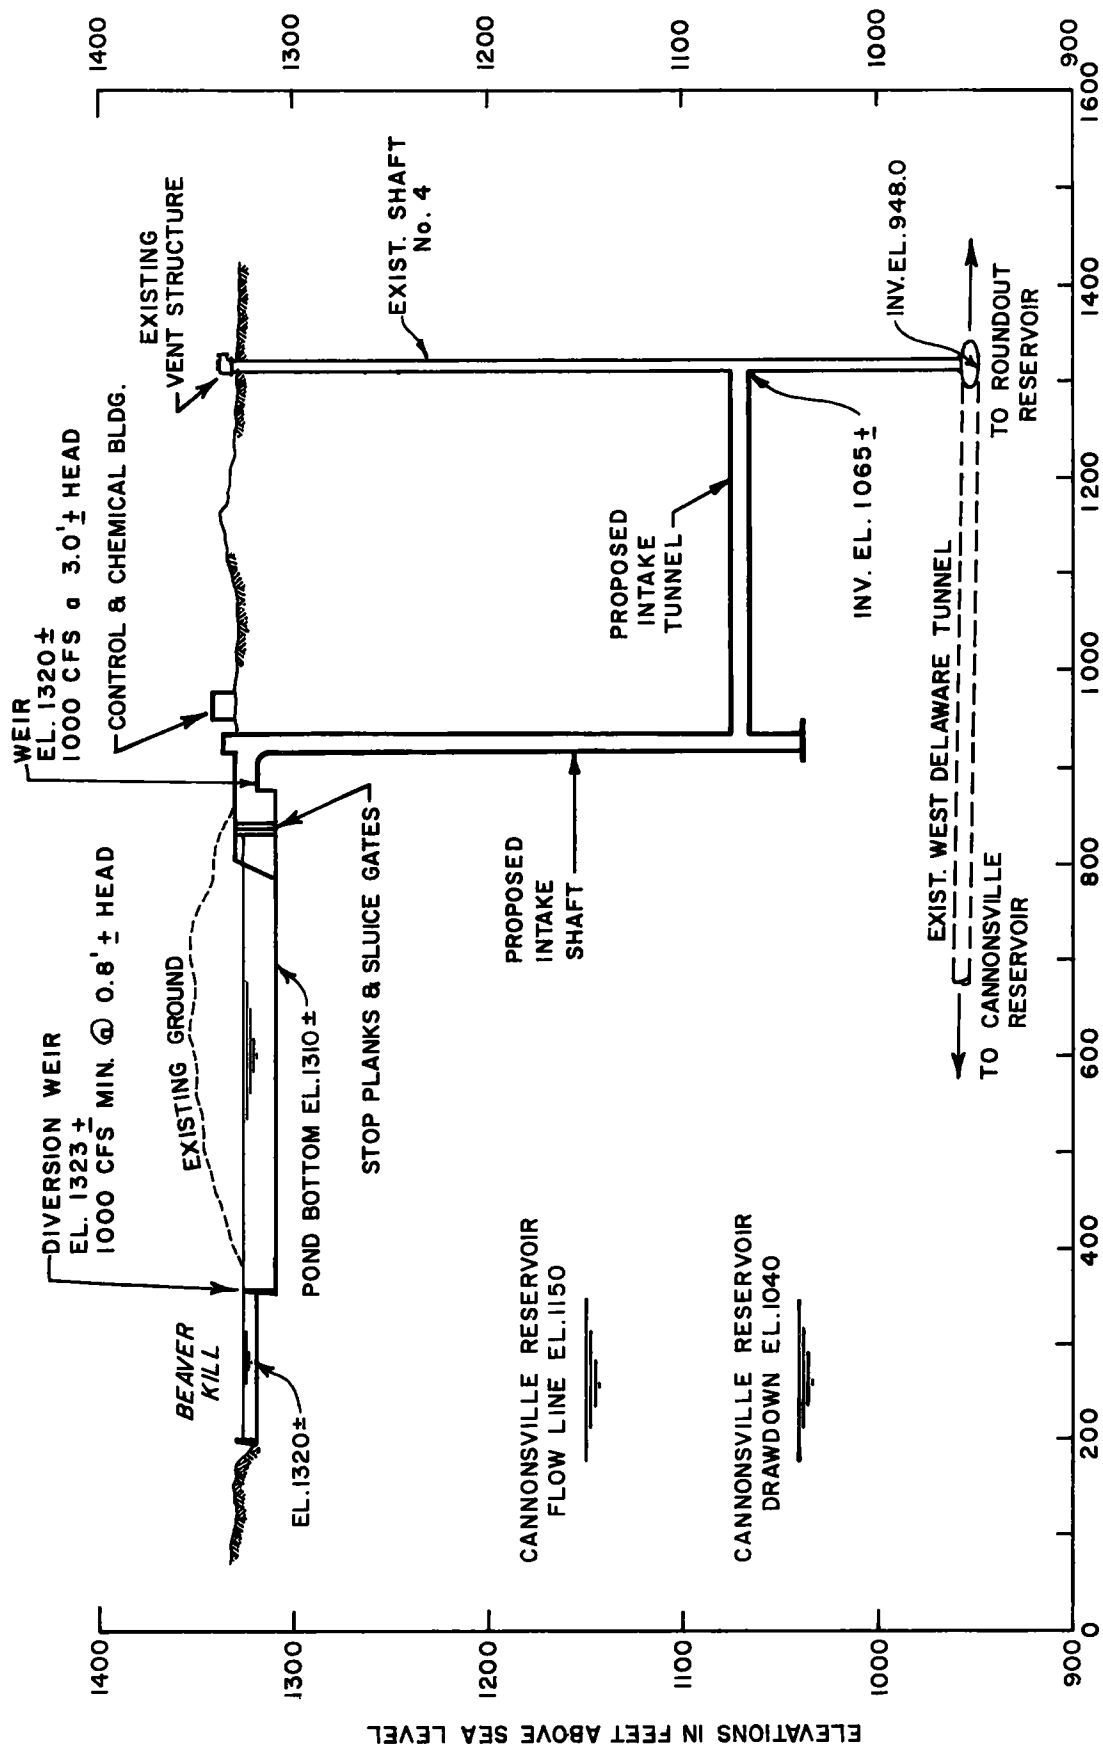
BEAVER KILL FLOOD SKIMMING PROJECT - PROFILE
